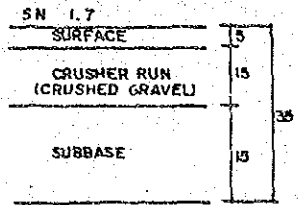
EXAMPLE OF CROSS SECTION DESIGN
